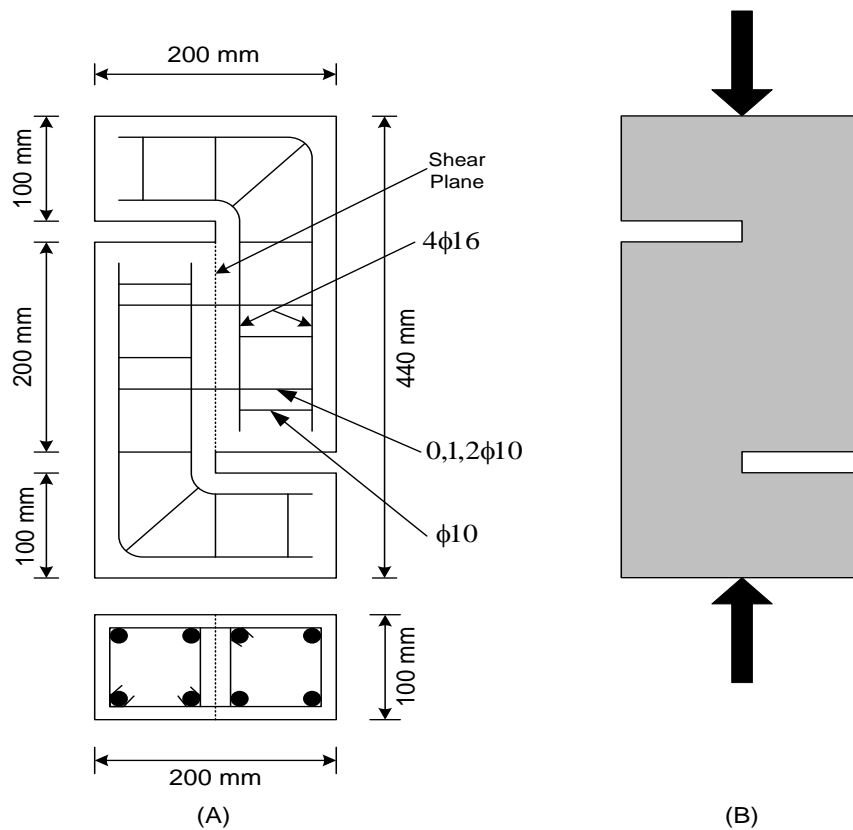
(A) Dimensions And Reinforcement Details Of Push-Off Specimen. (B) Loading Arrangement Of Push-Off Specimens.
